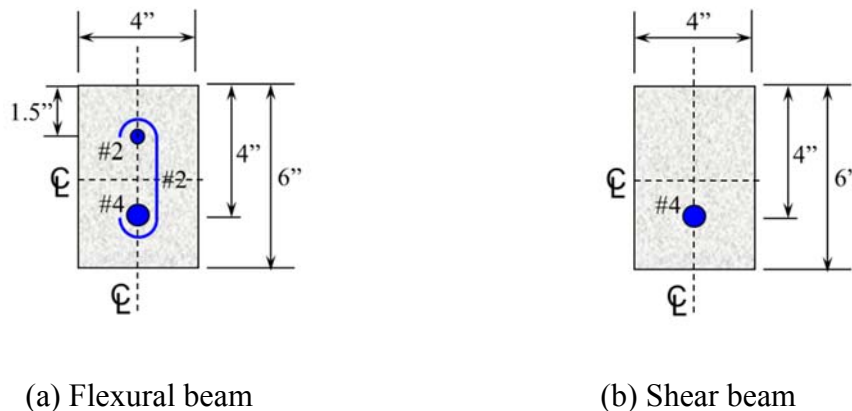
Cross-sectional details of the reinforced concrete beams.
